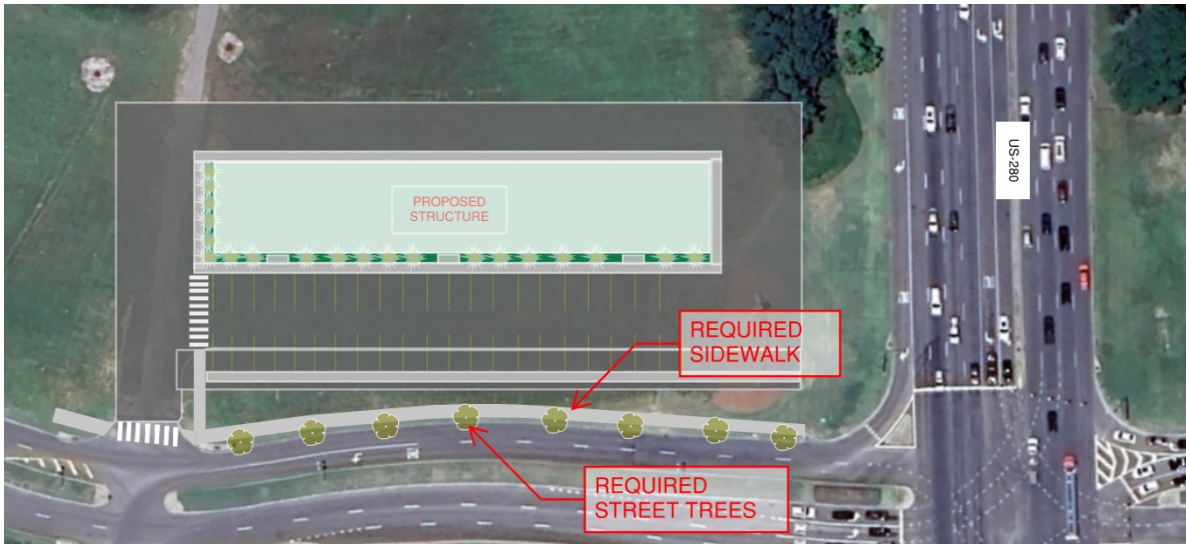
B: Hypothetical Proposed Development with Required Sidewalk and Street Trees
